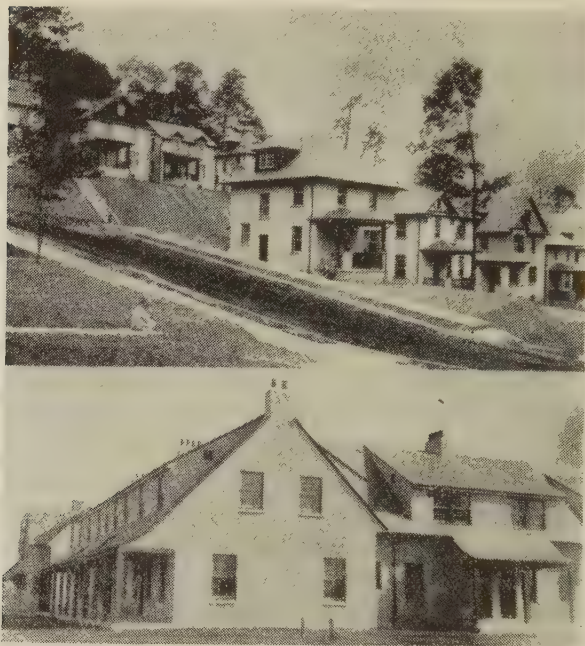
CONCRETE HOUSES FOR CAMBRIA STEEL CO. EMPLOYEES, JOHNSTOWN, PA.
